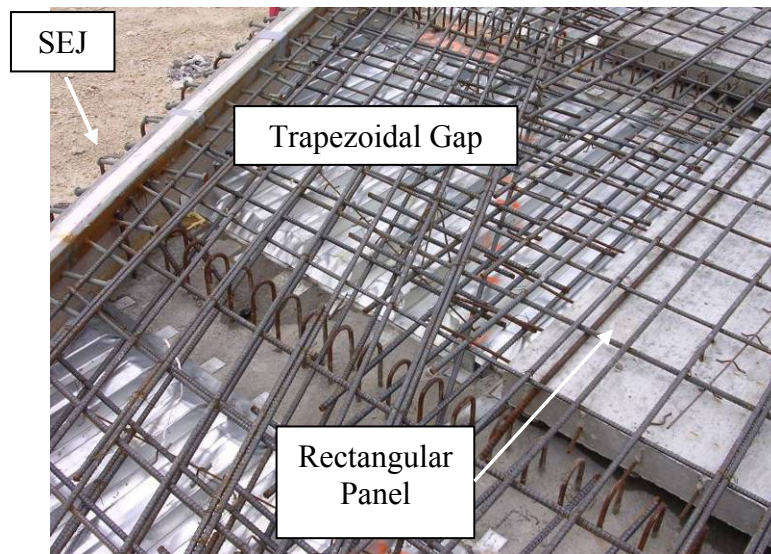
Trapezoidal Gap Adjacent to Skewed Expansion Joint
